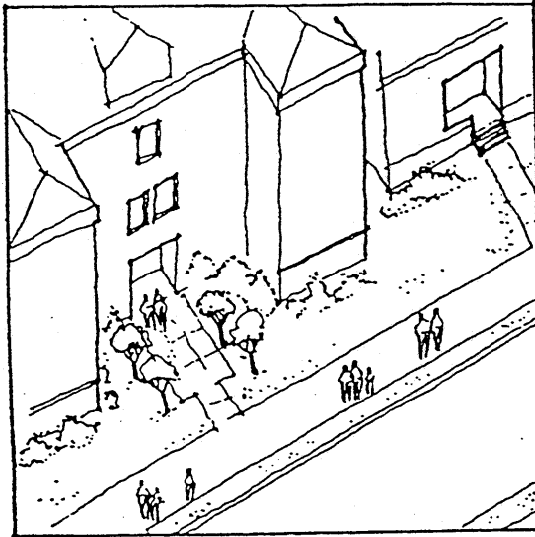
This building is located facing the street with a prominent entrance and pedestrian path to the sidewalk.
